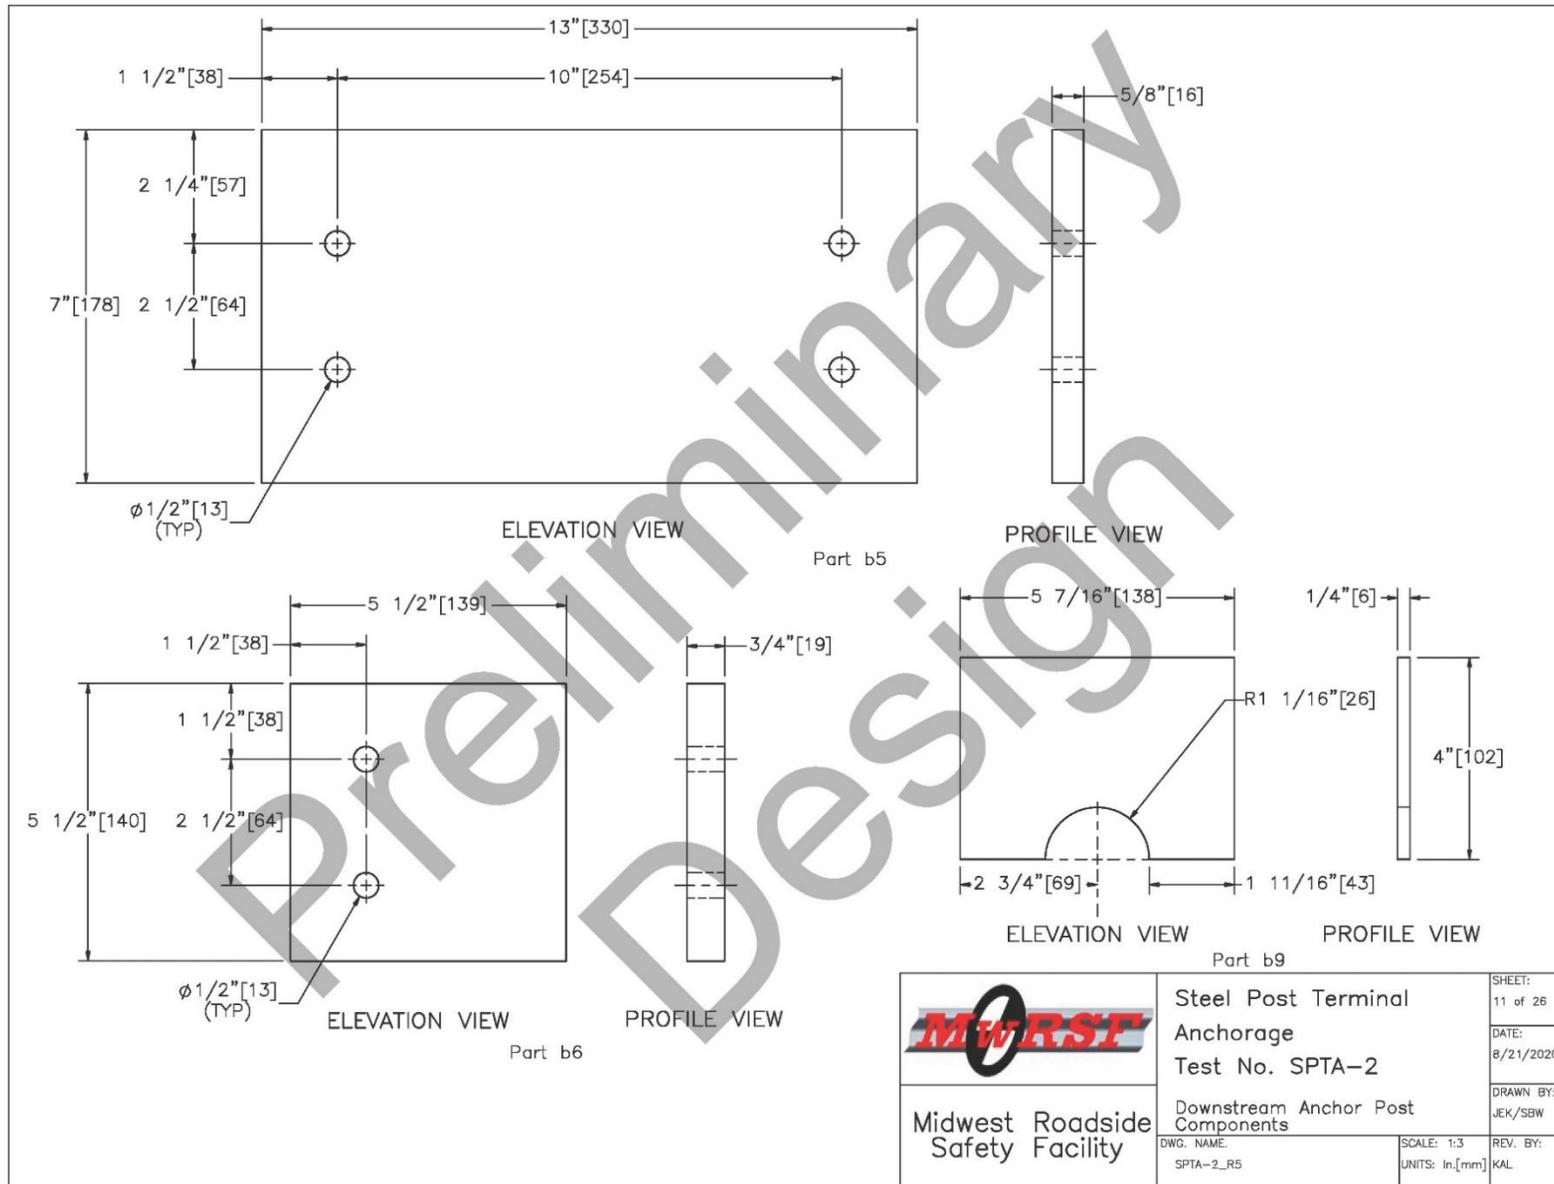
Downstream Anchor Post Components, Test No. SPTA-2
